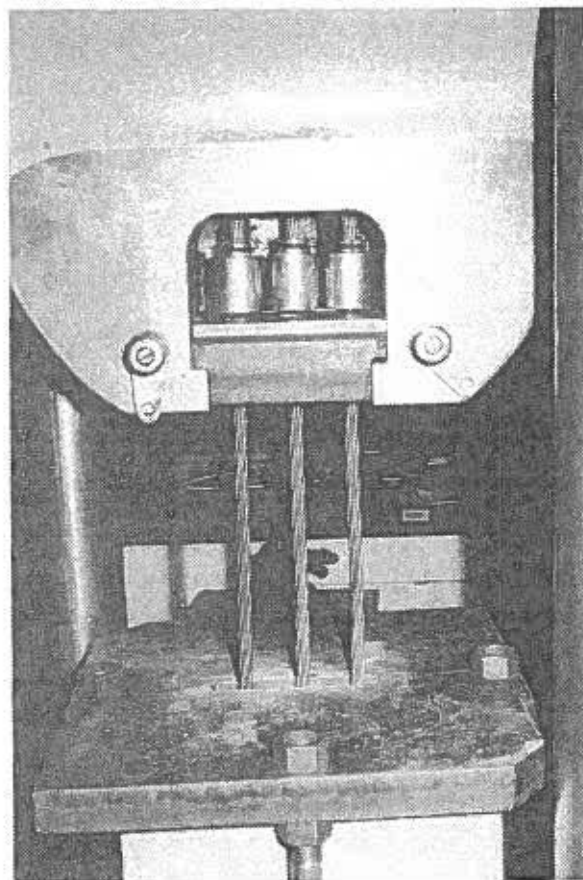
Anchoring of the strand ends to the pulling head of the hydraulic testing machine.
